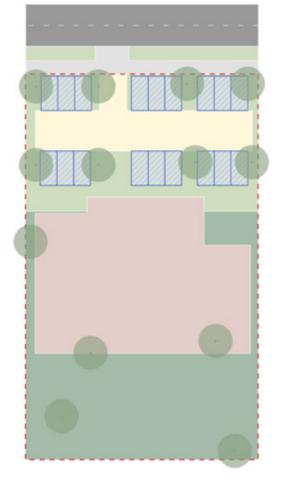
Acceptable courtyard parking arrangement with additional planting
